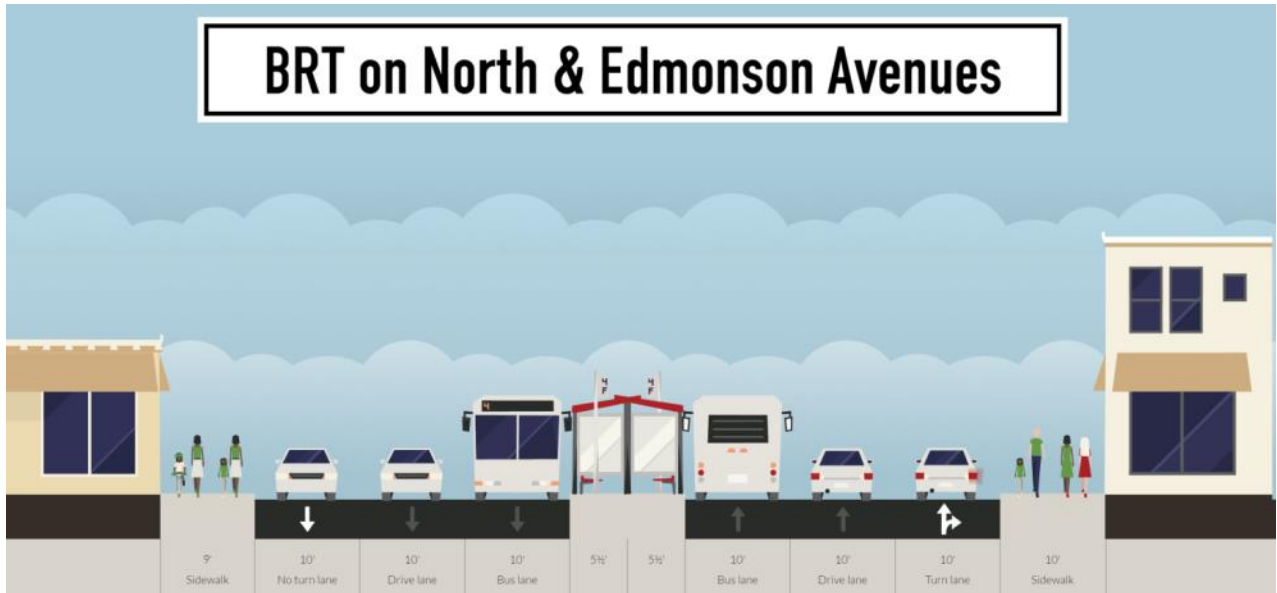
Standard BRT cross section applicable to North Avenue and Edmonson Avenue sections
